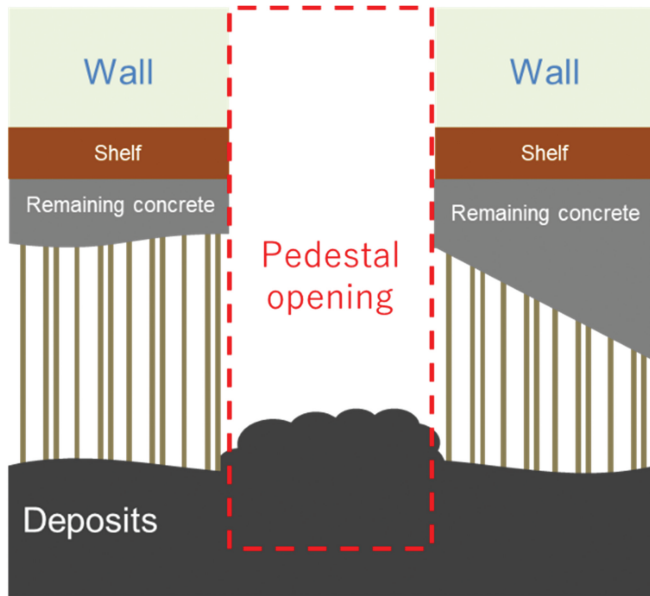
Illustration of the wall states on both sides of the pedestal opening as seen from the outside (structures and horizontal rebars omitted).
